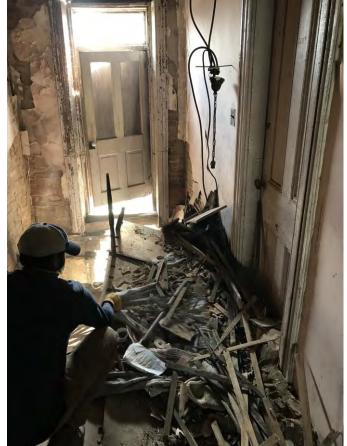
, Wall and Ceiling Finishes, view of collapsed 2<sup>nd</sup> Floor down to collapsed 1<sup>st</sup> Floor
